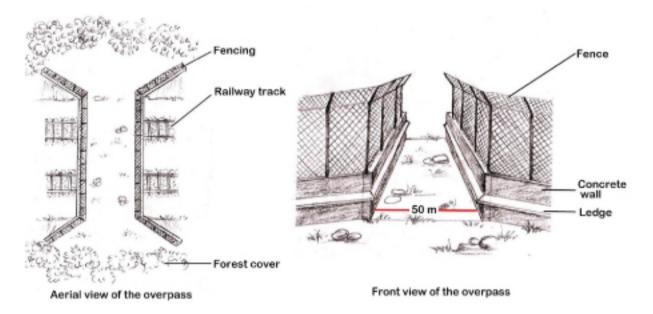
Aerial and front view of overpasses on railway tracks, with fencing/noise and sound barrier details.
